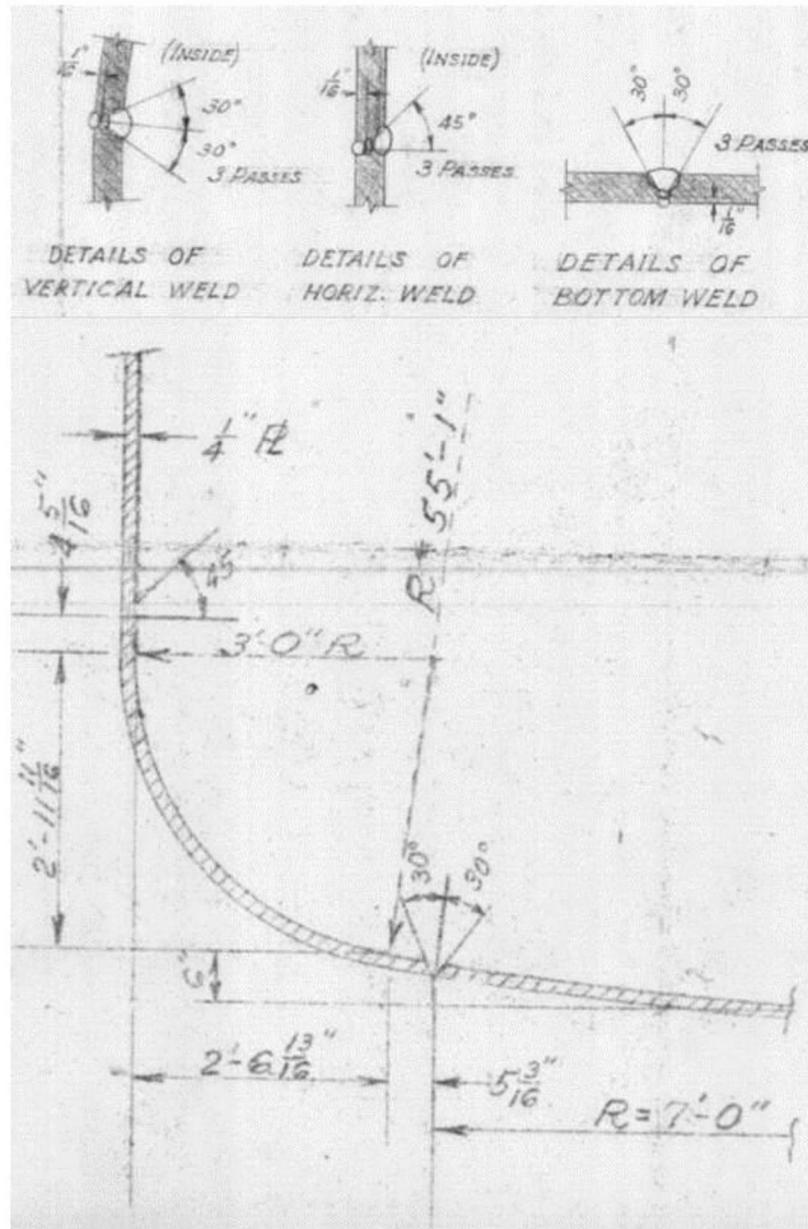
Construction Drawing for 241-B, -C, -T, and -U Farm, 200-Series Tanks Bottom Knuckle Weld (Drawing D-23)
